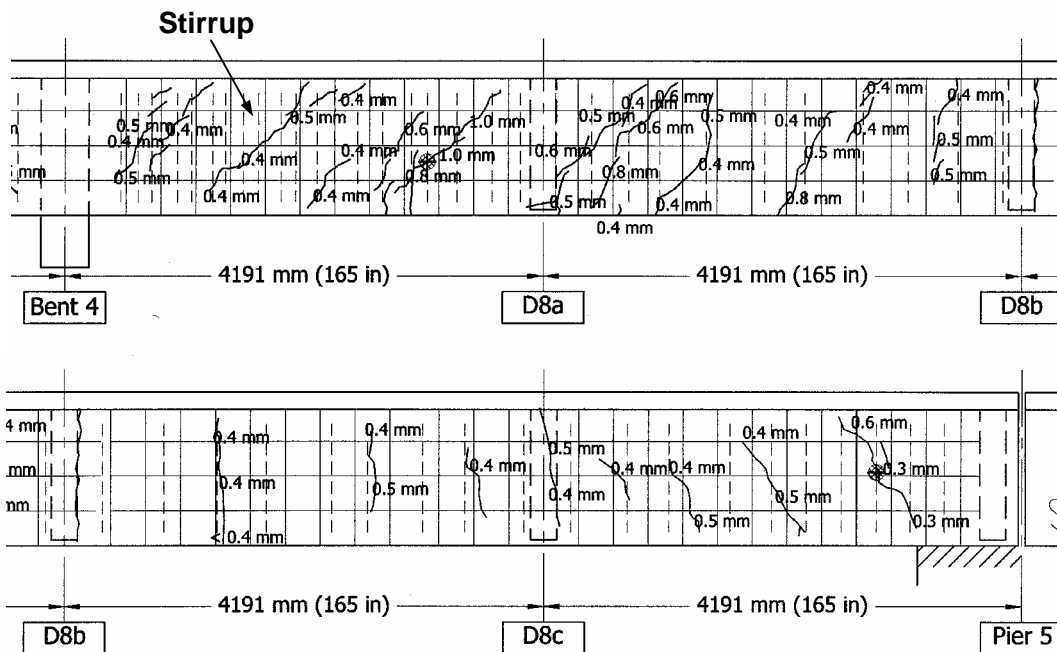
Example diagonal cracks and crack and stirrup mapping
